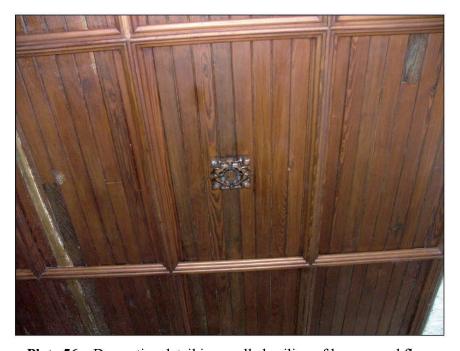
Decorative detail in panelled ceiling of bar, ground floor
